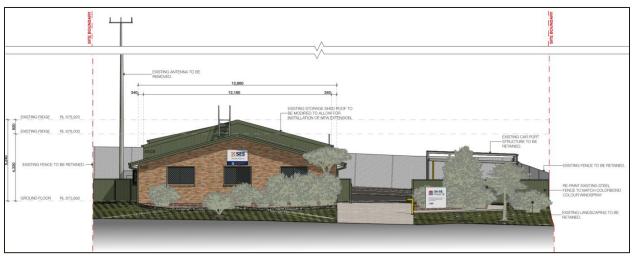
Existing South Elevation (Source: Lead Architects 2024)
